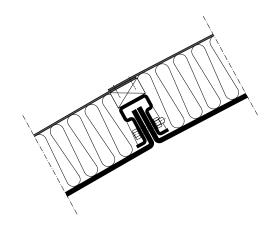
Aluminium plate connection detail, after Pavlov [95]
